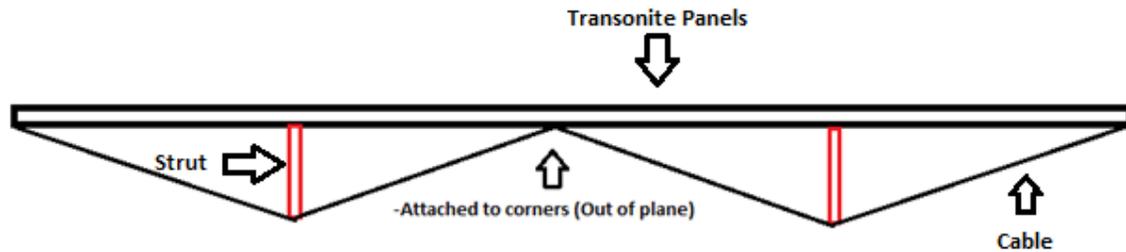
Diagonal section view of the roof and four strut cable stayed trusses
